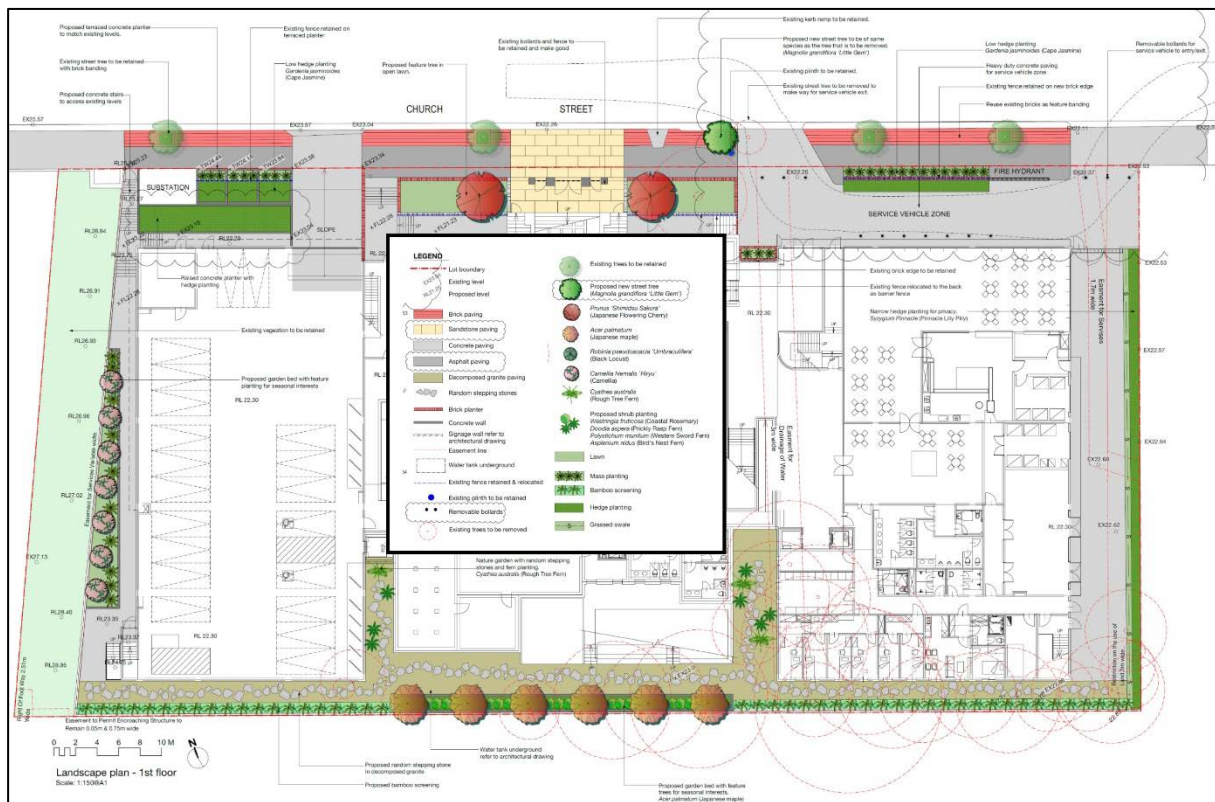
| Proposed Landscape Plan – Ground Level (Source: Moir Landscape Architects)
